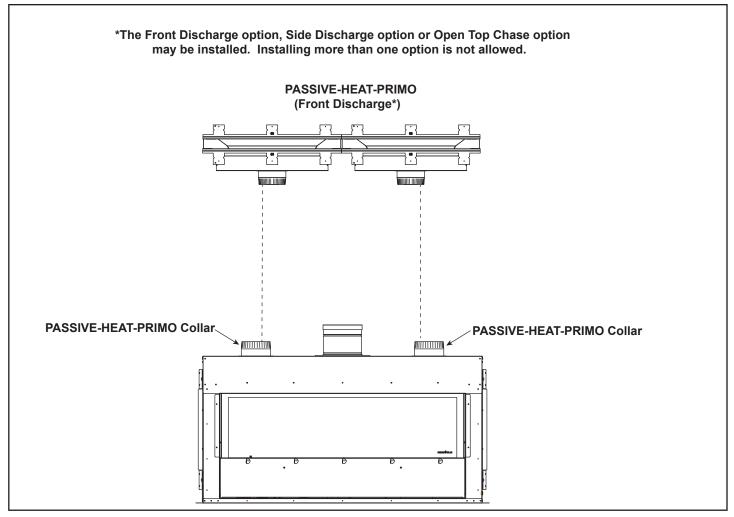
PRIMO Passive Heat Front Discharge Configuration / Remove PRIMO Passive Heat Seal Plates
